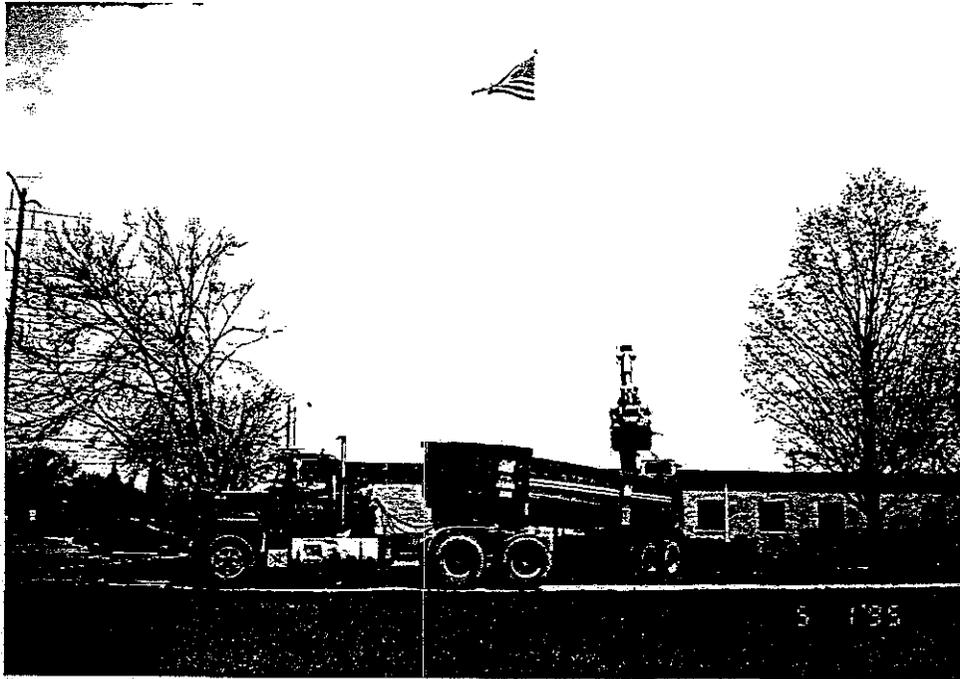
Date: May 1, 1995. Photo taken facing north.
